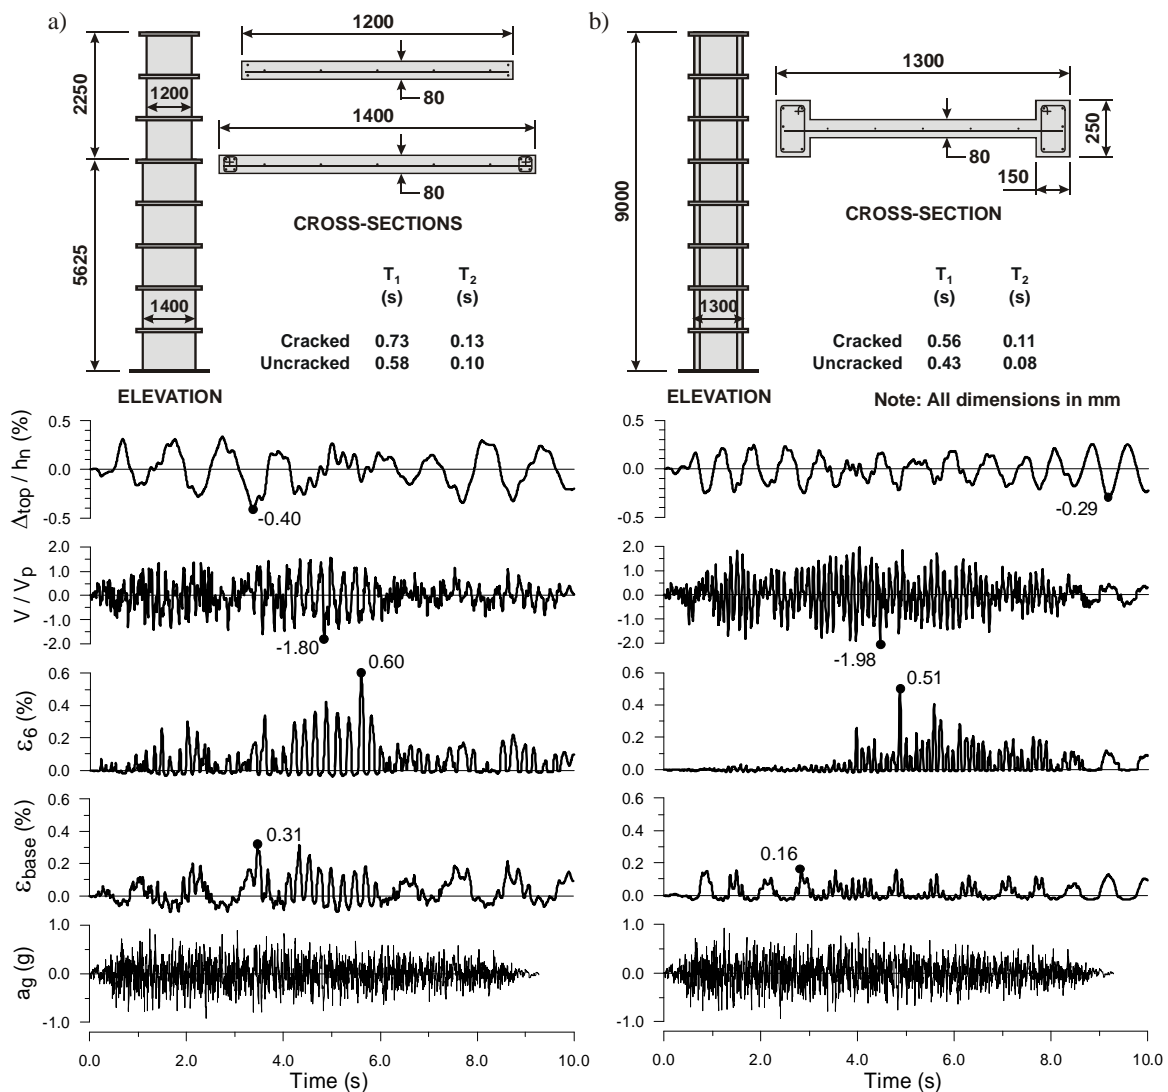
Properties and predicted response of test specimens studied: a) Rectangular wall; b) I-Shaped wall.
